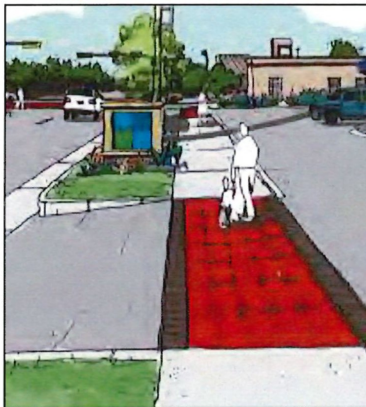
Example of Pedestrian Crossing at a Retail Driveway
